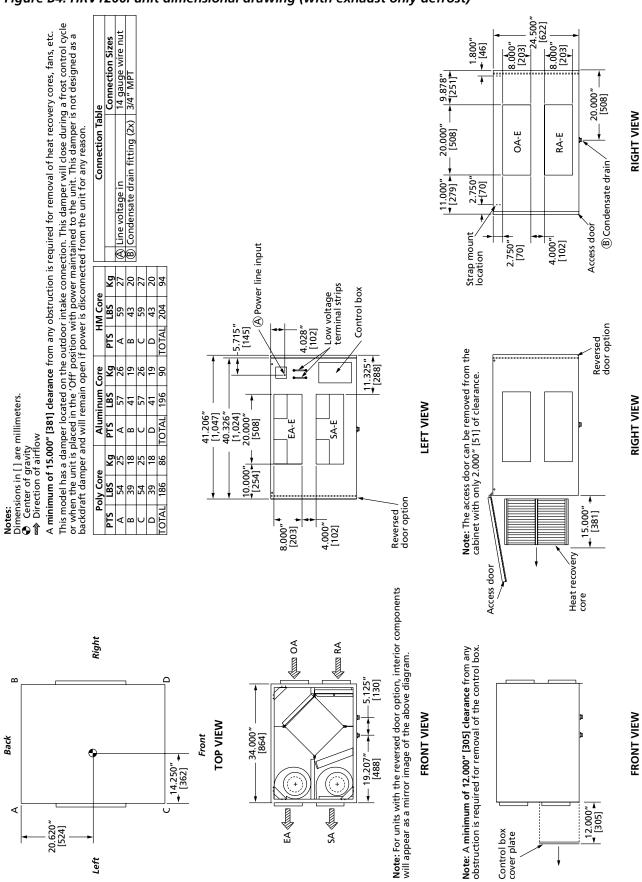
HRV1200i unit dimensional drawing (with exhaust only defrost)
